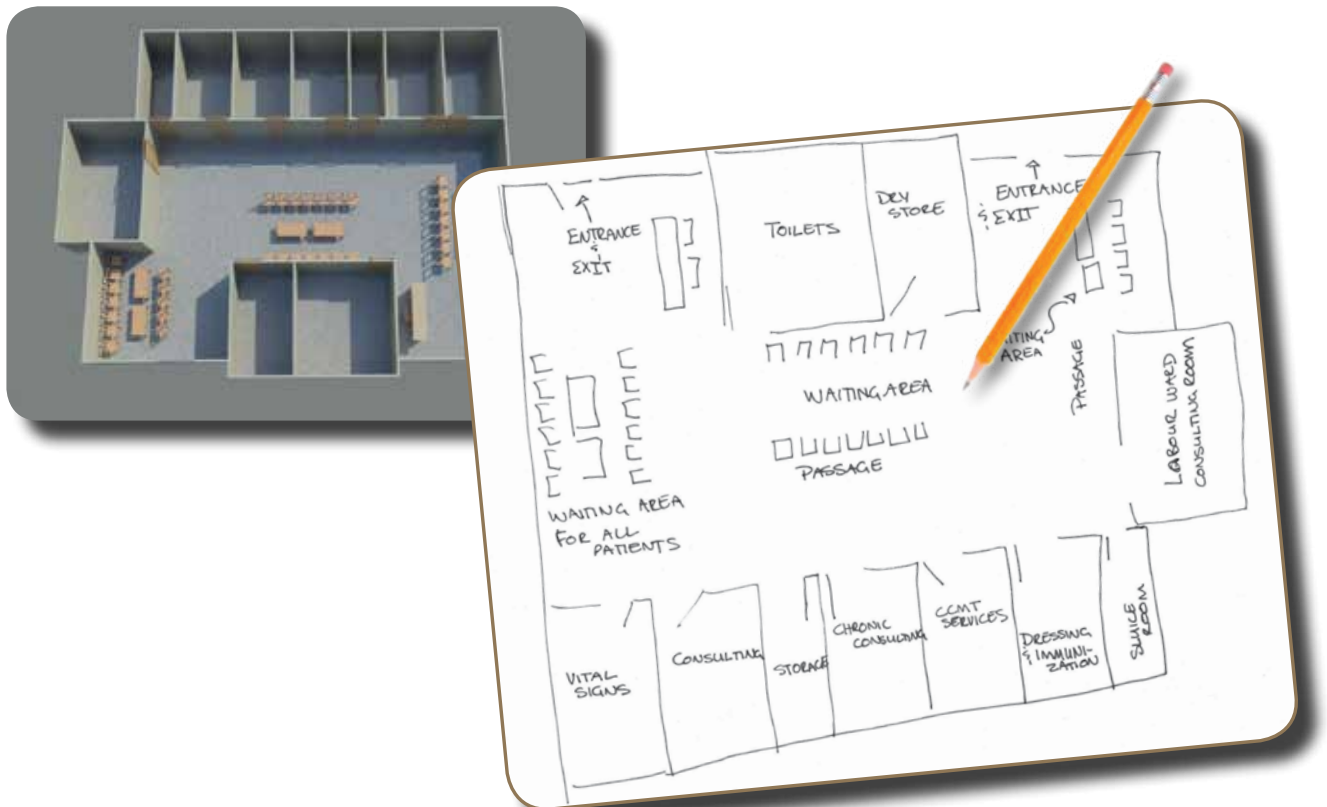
EXAMPLE OF A SKETCHED FLOOR PLAN
